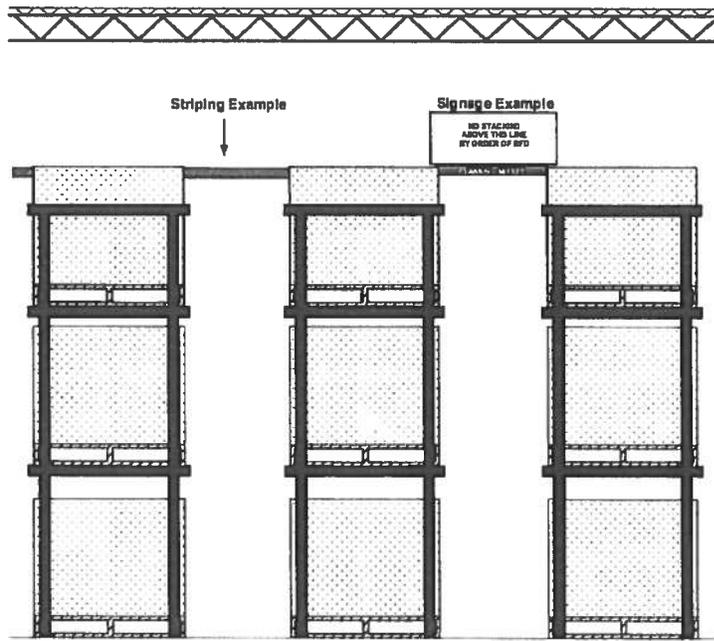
END OF AISLE VIEW OF SIGNAGE AND STRIPING PLACEMENT EXAMPLE
